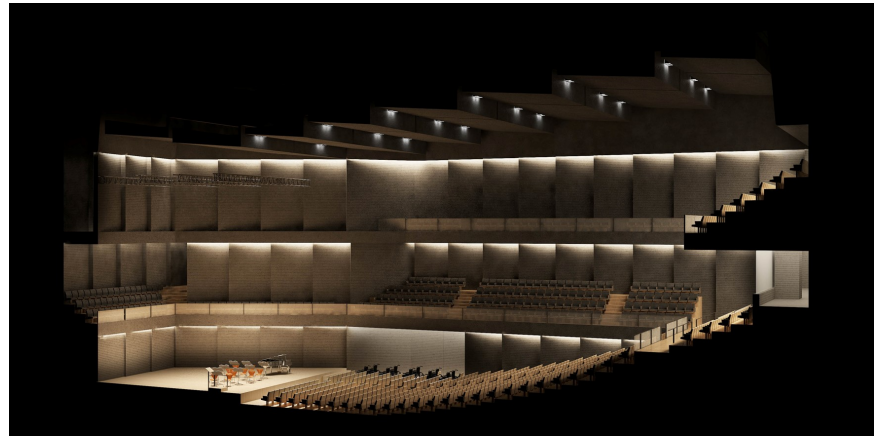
Interior Elevation (rendering courtesy of gmp Architects)
